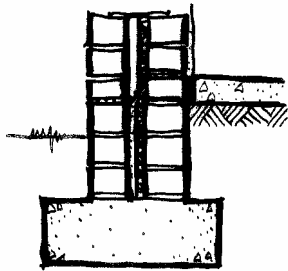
Rigid insulation in foundation cavity wall with concrete filling
